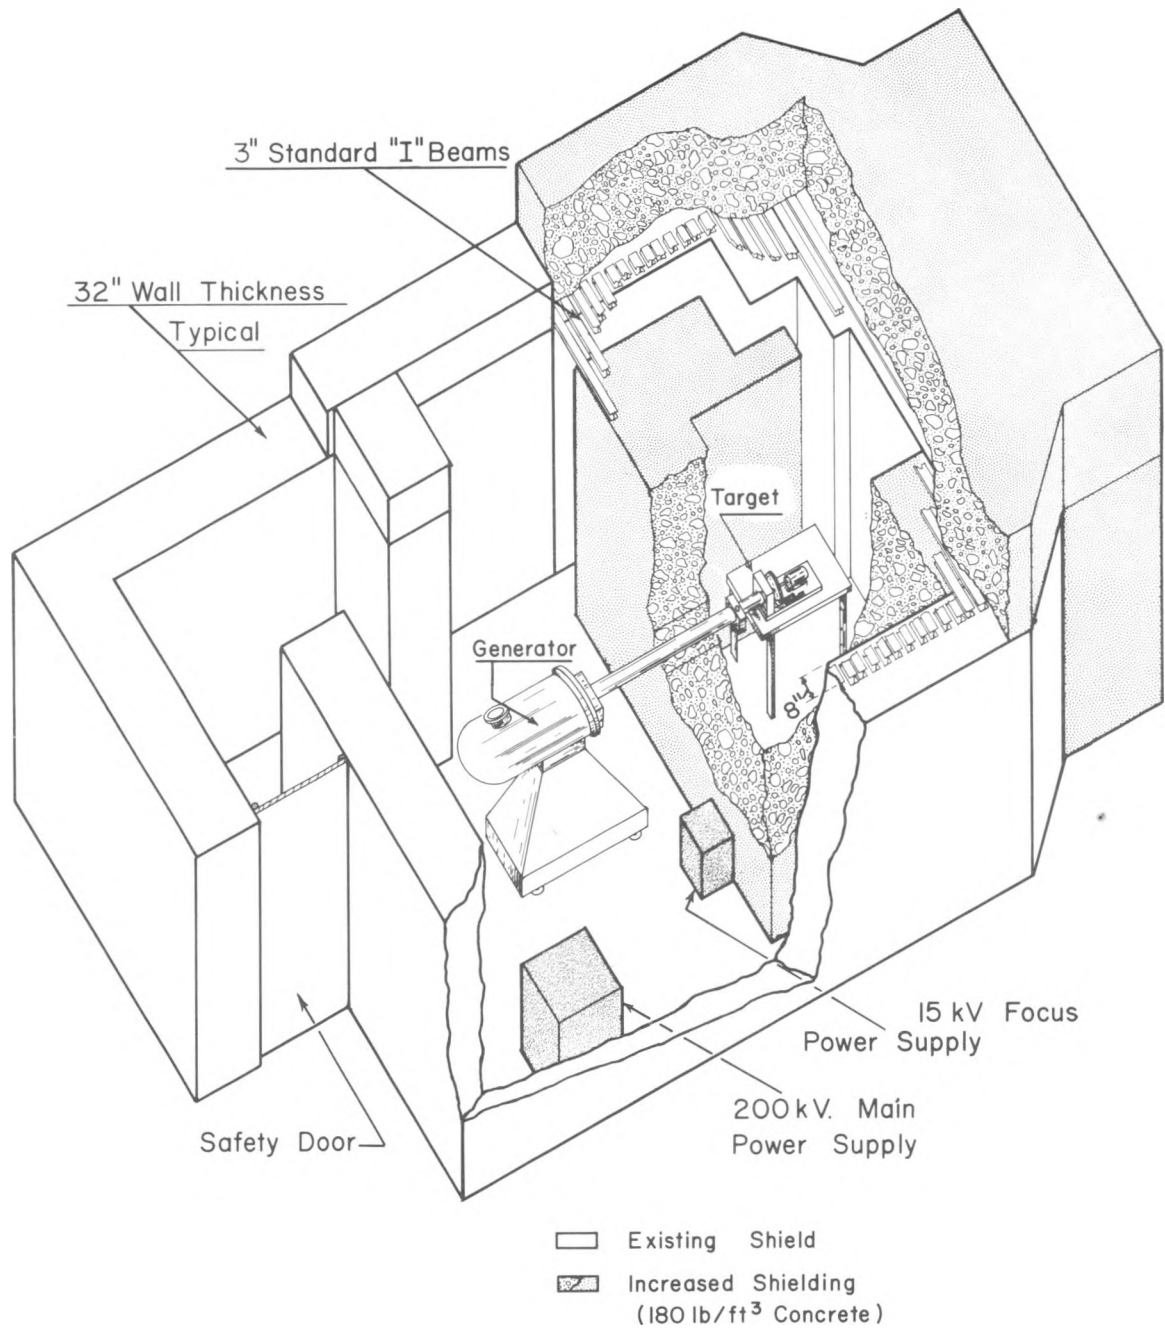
Cutaway drawing showing the location of the neutron generator in the biological shield.
